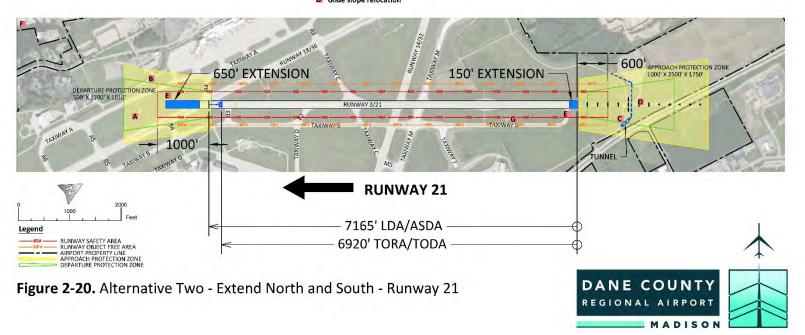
Alternative 2 – Extend Runway 21 North and South
